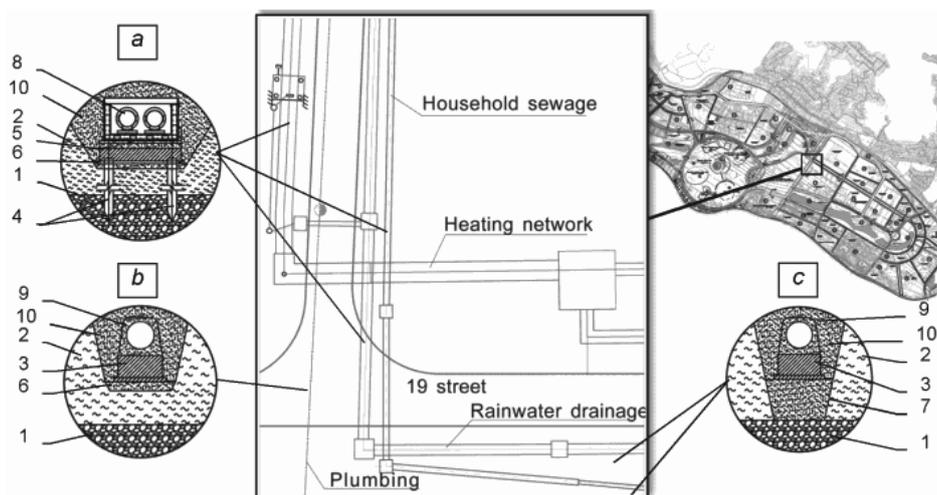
Design solutions for foundations of underground water lines within Imeretin lowland terrain: a – driven pile footing; b – concrete strip footing on natural soil; c – concrete strip footing on replaced soil (replacement of soft soils by sand and gravel mixture). (1 – sand and gravel soils; 2 – soft clay soils; 3 – concrete strip footing; 4 – concrete driven pile; 5 – concrete raft; 6 – sand and gravel fill; 7 – replacement of soils with sand and gravel fill; 8 – pipeline in protective duct; 9 – pipeline wrapped around with geotextile in sand fill; 10 – sand backfill).
